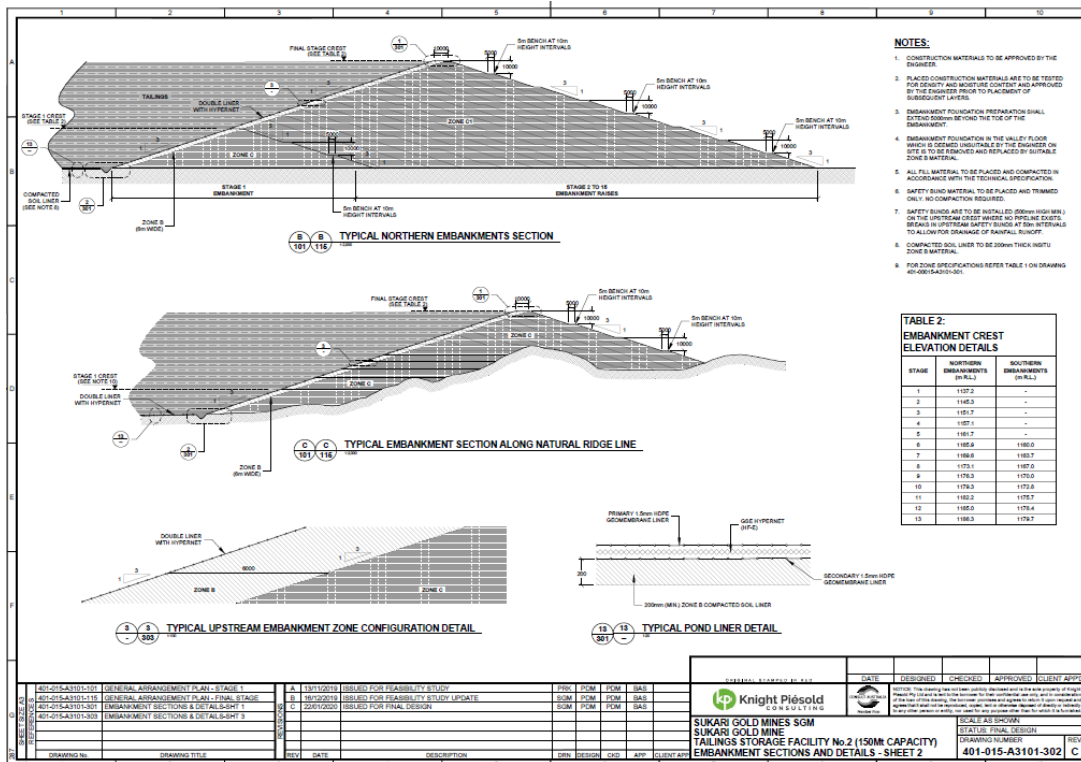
Typical Cross Sections of TSF No. 2 Northern and Southern Embankments
